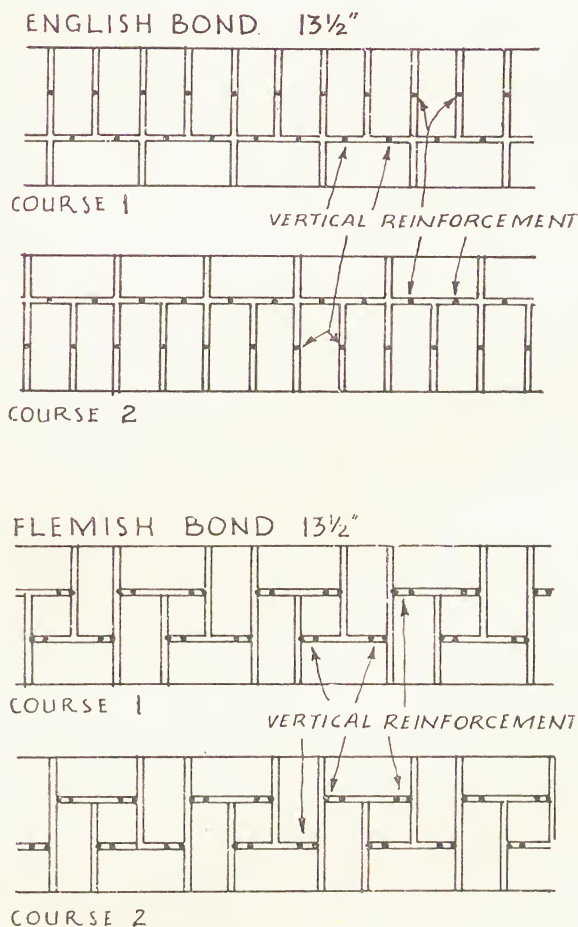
Reinforced brickwork. Plans of 13½-inch walls, showing positions of vertical reinforcement in straight joints.
